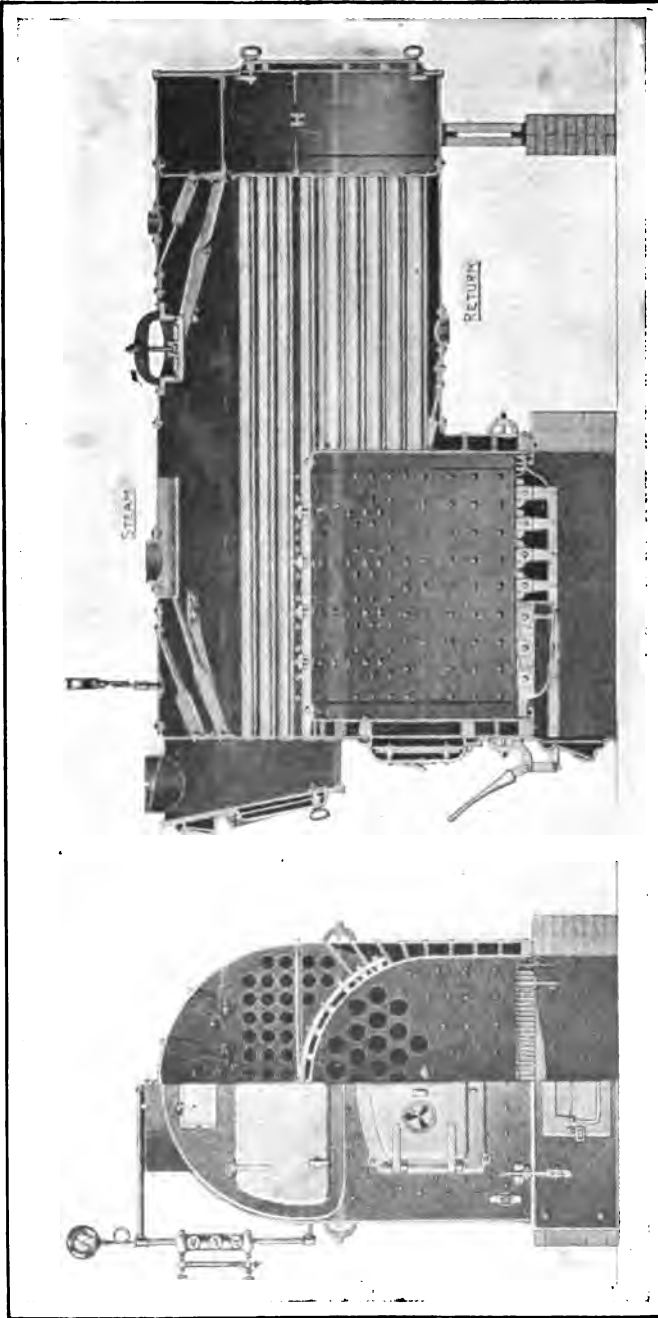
TYPE OF HORIZONTAL TUBULAR BOILER USED EXTENSIVELY IN SCHOOLHOUSE HEATING
